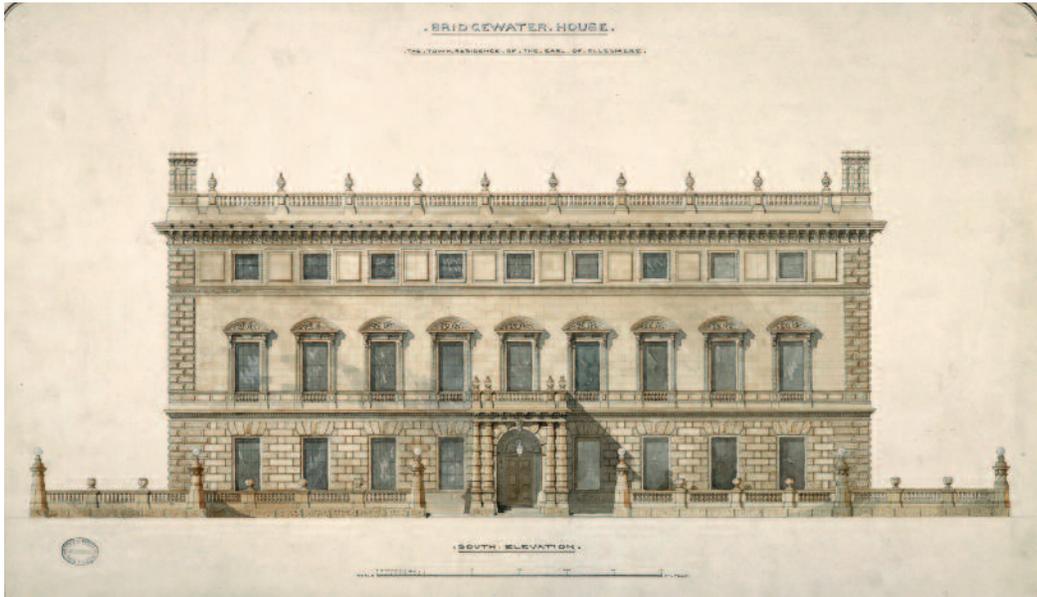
South Elevation of Bridgewater House as executed by Charles Barry.
